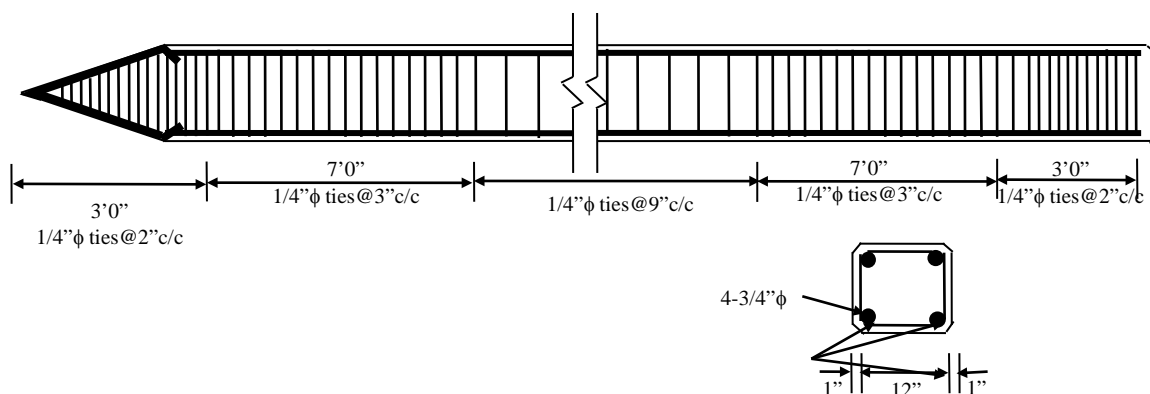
Details of a 14''x14'' Precast Reinforced Concrete Pile
